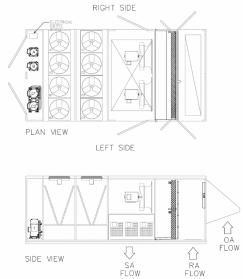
Draw Through Supply Fan, End Compressor, Both Side Access
